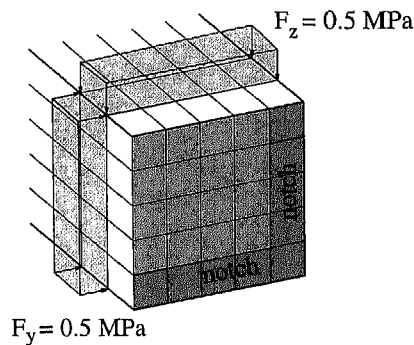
Force and notch localisation of the modified notched concrete beam.
